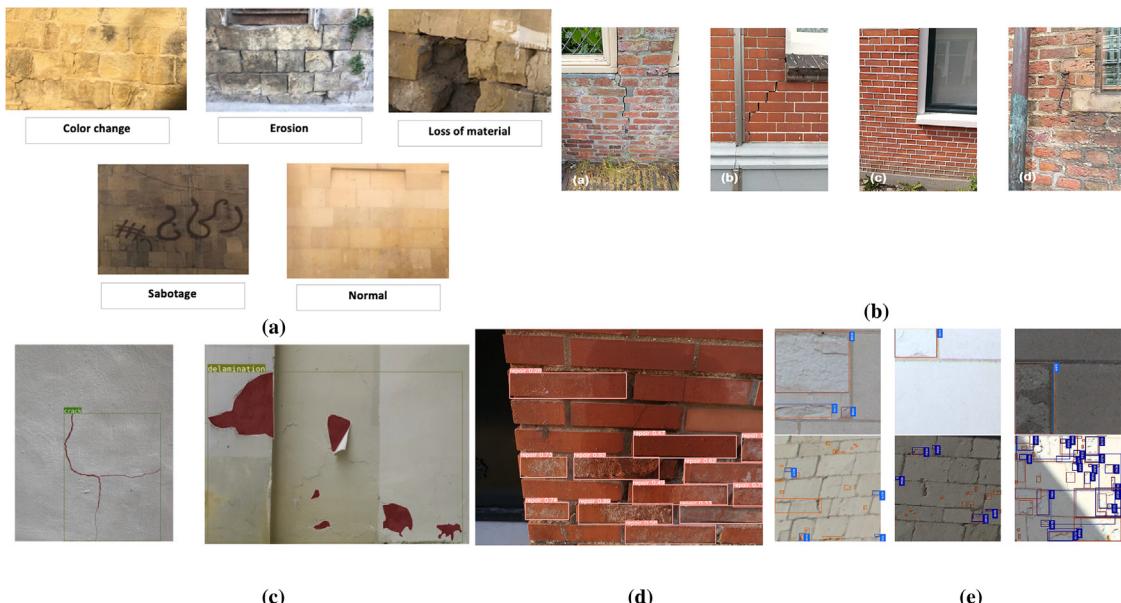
a) CNN deployed by Samhouri et al. [59] for façade damages in “Al-Salt” in Jordan, b) masonry surface defects considered by Dais et al. [64], c) sample façade defects (e.g. crack and delamination) [62], d) AI-system for façade bricks to indicate need to clean or repair [66] (red bounding box and red text showing repair label), e) correct (first row) and incorrect (second row) AI-assisted models results for tiny degradation on surfaces [63] (red bounding box showing predictions with confidence score in blue text).
